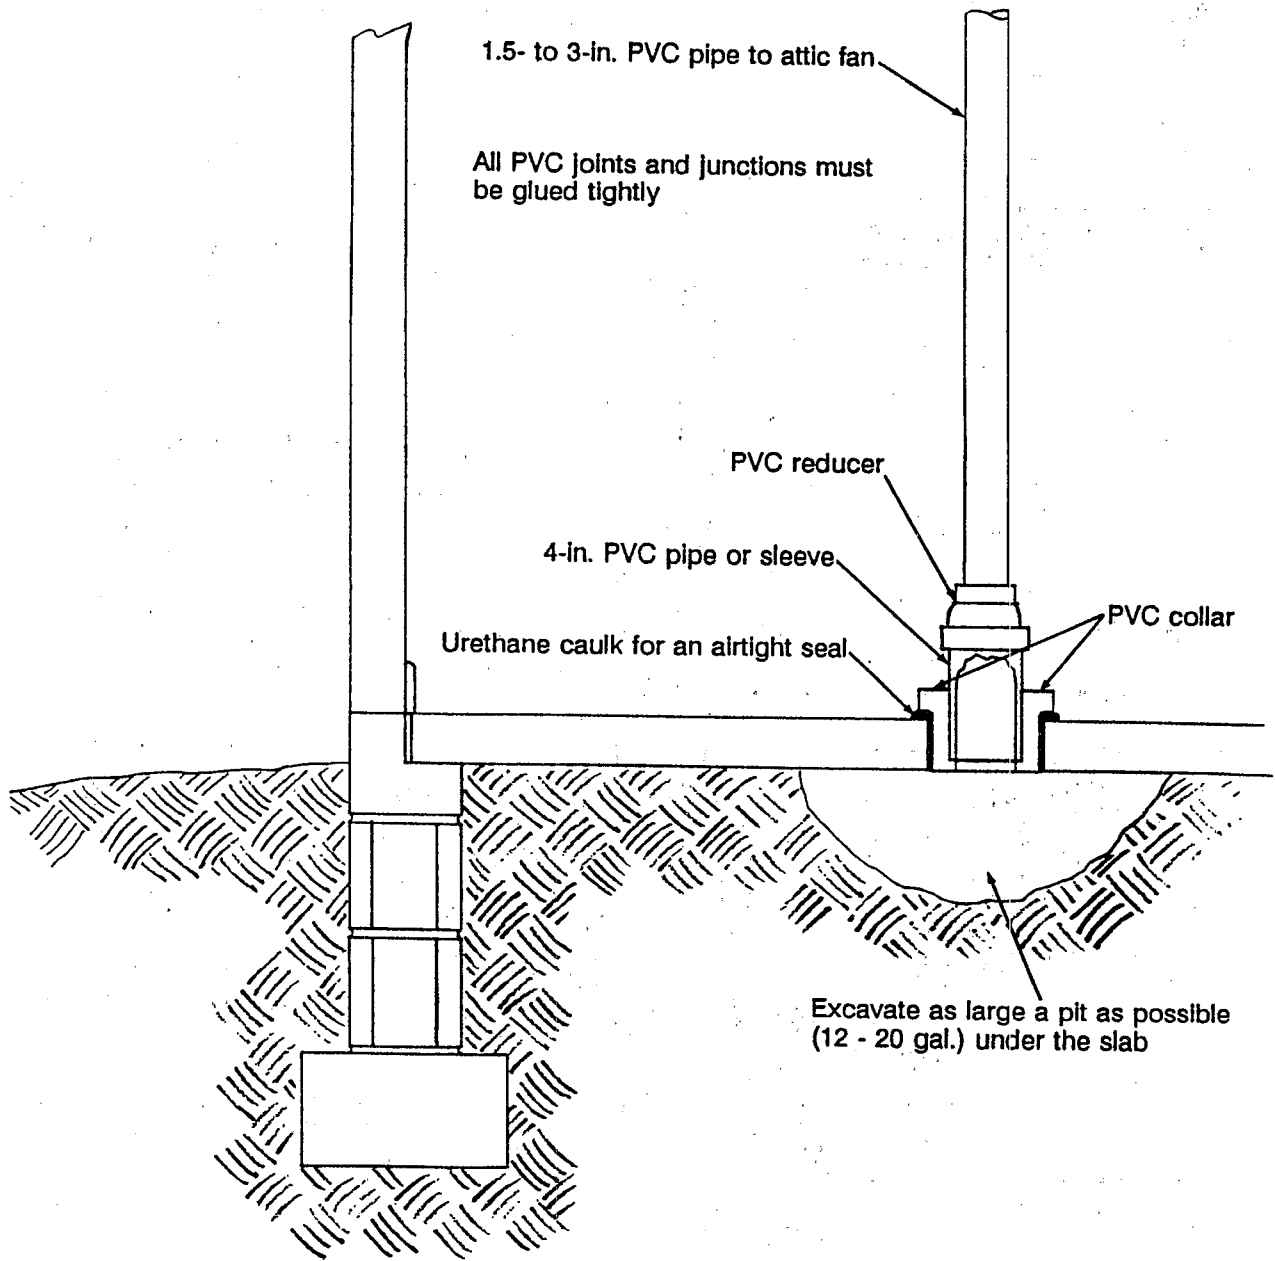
Illustration of a typical interior suction point showing the 4- to 5-in. hole drilled through the slab, the 12- to 20-gal. pit excavated under the slab, and a sampling of PVC collars, sleeves, reducers, etc., leading to the exhaust pipe going into the attic.
